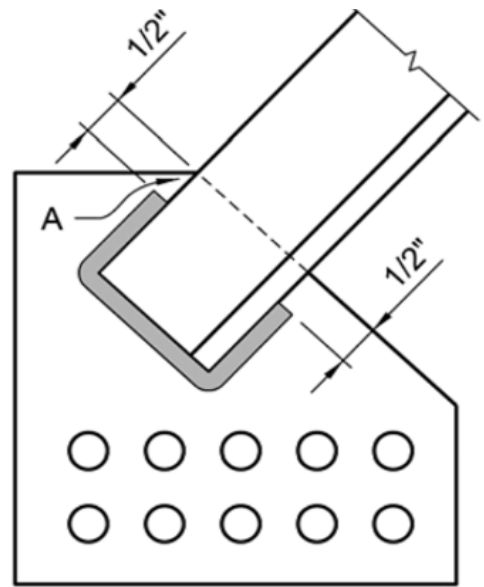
EXAMPLE BRIDGE CROSS FRAME DESIGN WITH WELD HOLDBACKS CORNERS
